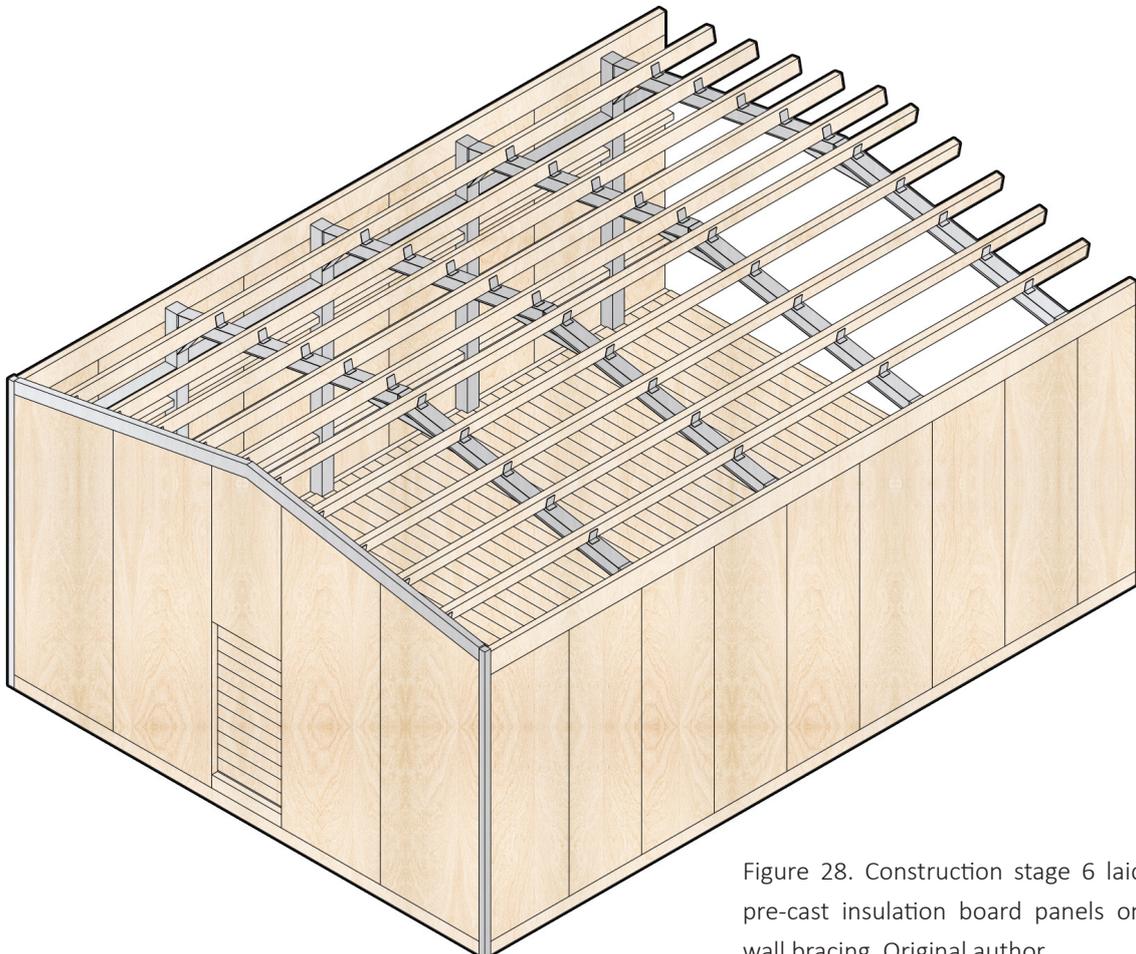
Construction stage 6 laid pre-cast insulation board panels on wall bracing. Original author
